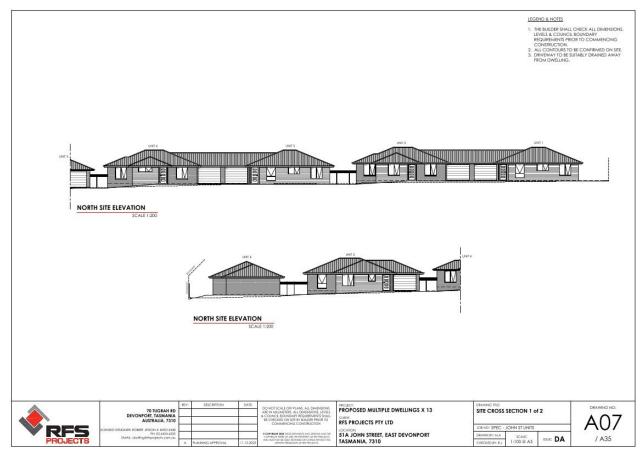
Elevations: 1 of 2 (RFS Projects, 2023)
